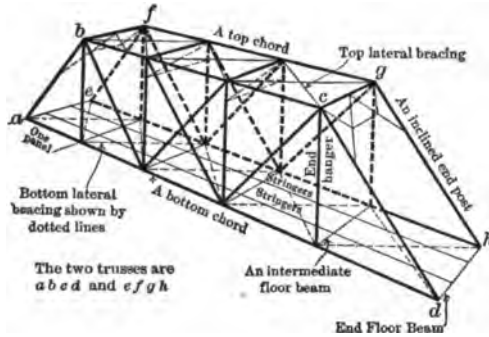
Framework of a Through Railroad Truss Bridge.
